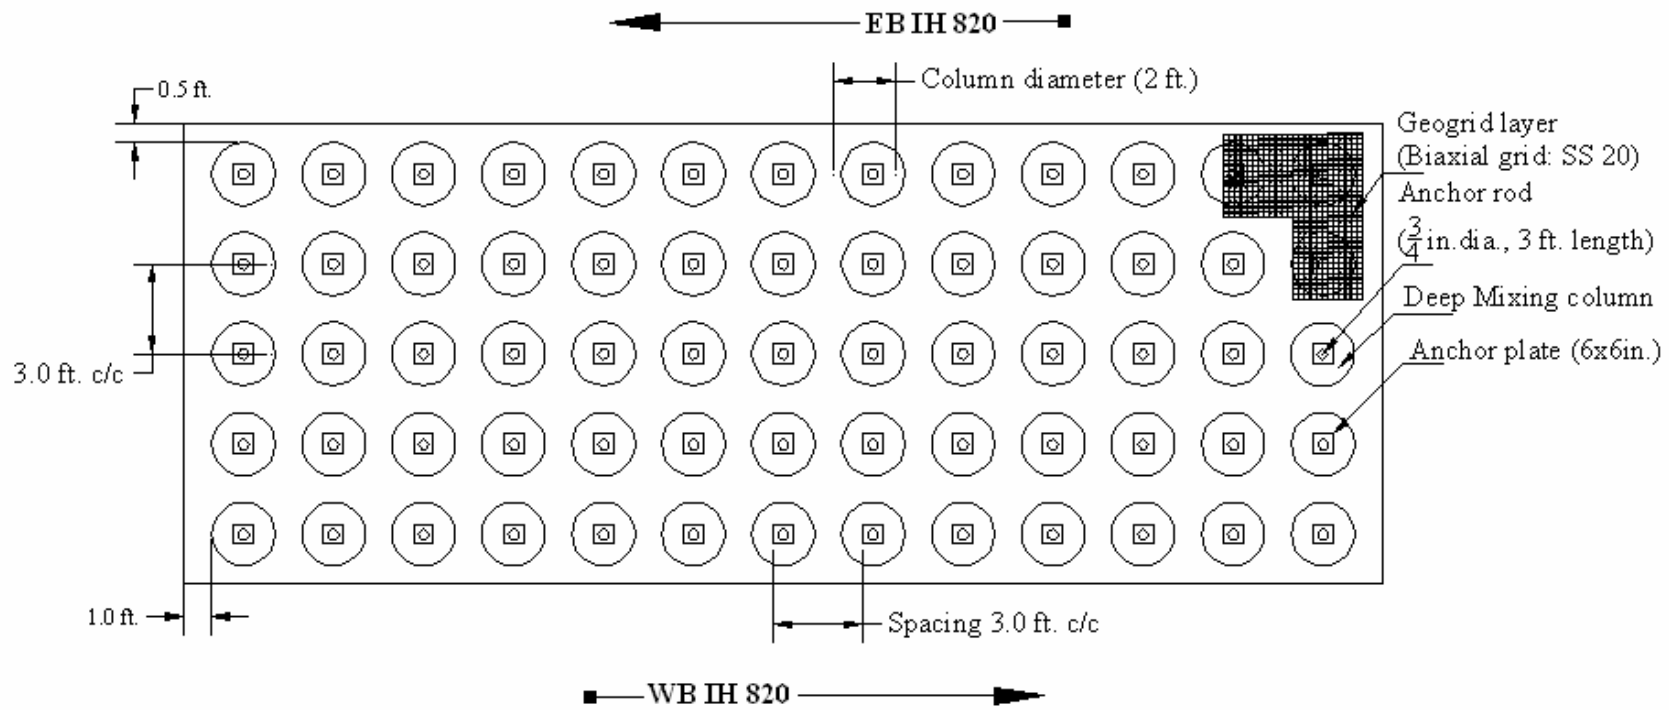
Plan View of DSM Column Layout of Test Site 1 (15 ft X 40 ft)
